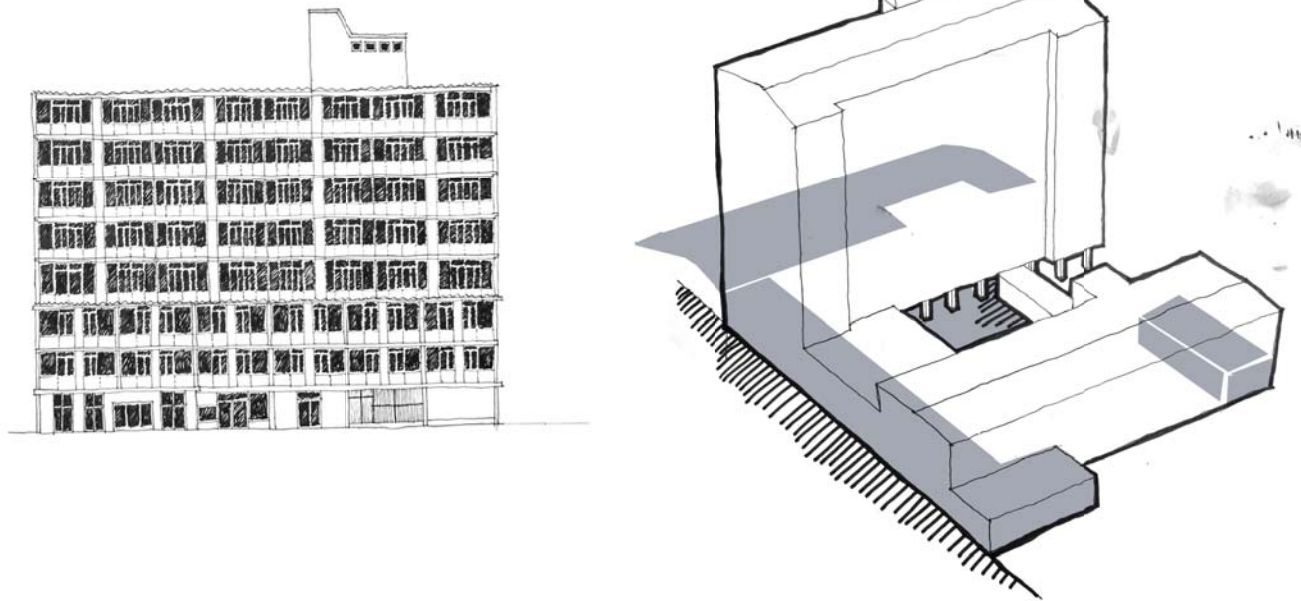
Top; Elevation and 3D of Esperanto apartments with potential expansion shown at the back (Author, 2019)
